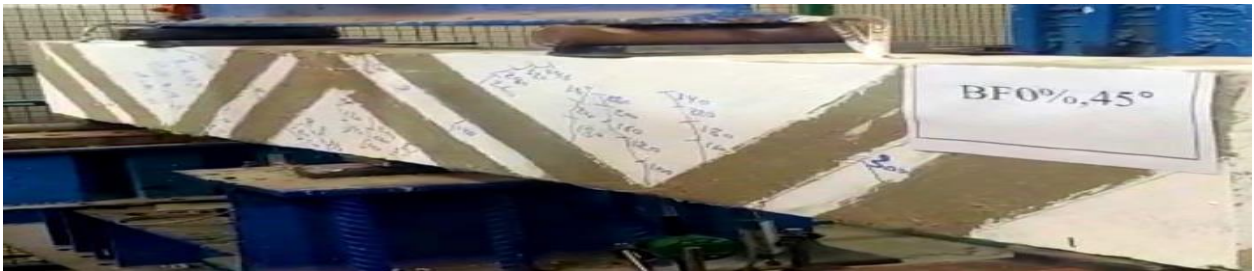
Cracks pattern after failure for (BF0%, 45°) beam
